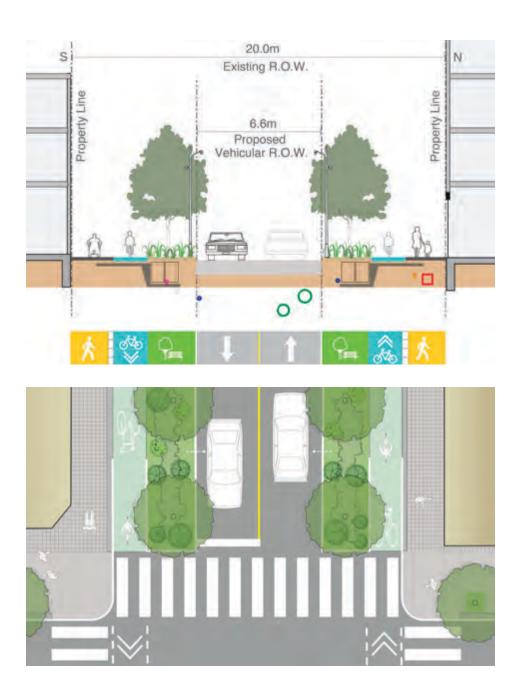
Section and Plan of Broadway Avenue - Recommended Final Condition with Bump-out at intersection with Yonge Street
